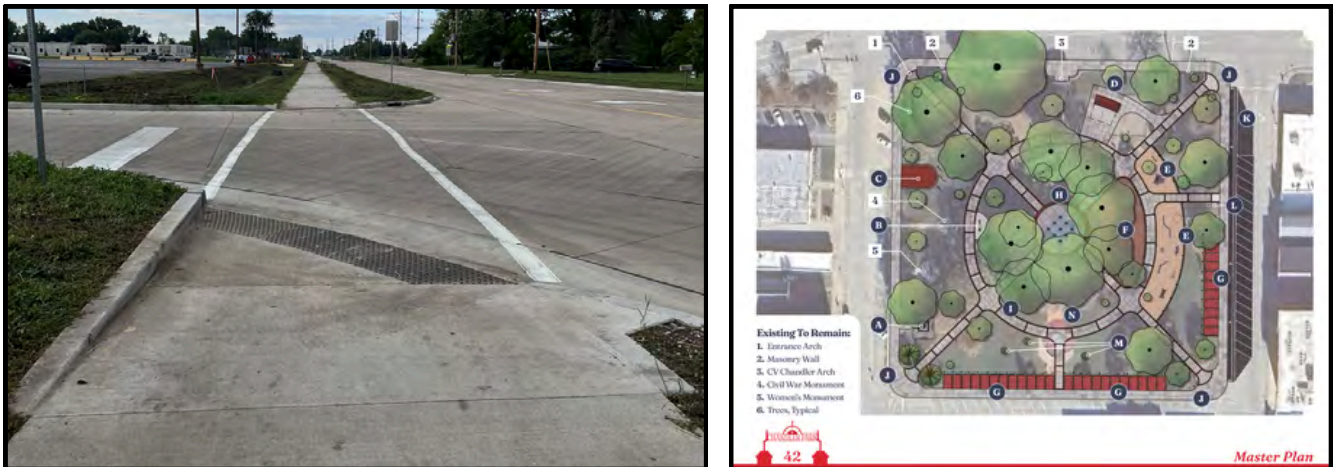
South Johnson Street improvements with expanded sidewalks (left)
